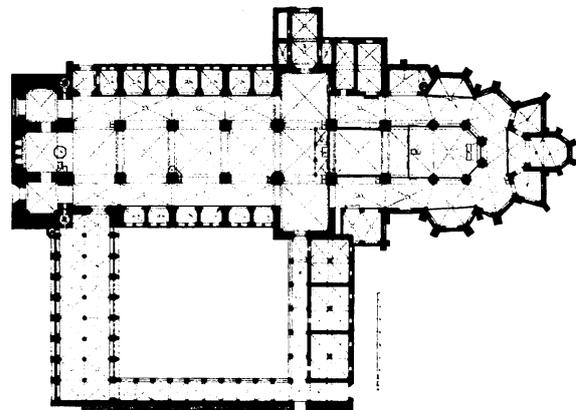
Plan of the Lübeck Cathedral with the circular passage around the chancel, built later. 1878. [Plan des Lübecker Doms vor 1878. online 19.06.2017, <http://upload.wikimedia.org/wikipedia/commons/thumb/7/77/GrundrissDom.png/220px-GrundrissDom.png>]
